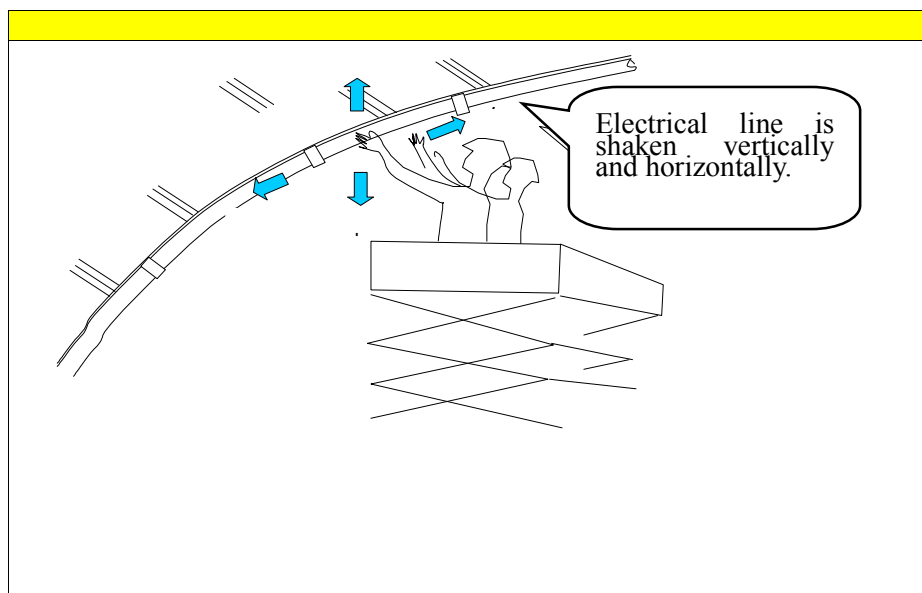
Schematic of close-up visual inspection of electrical line equipment
